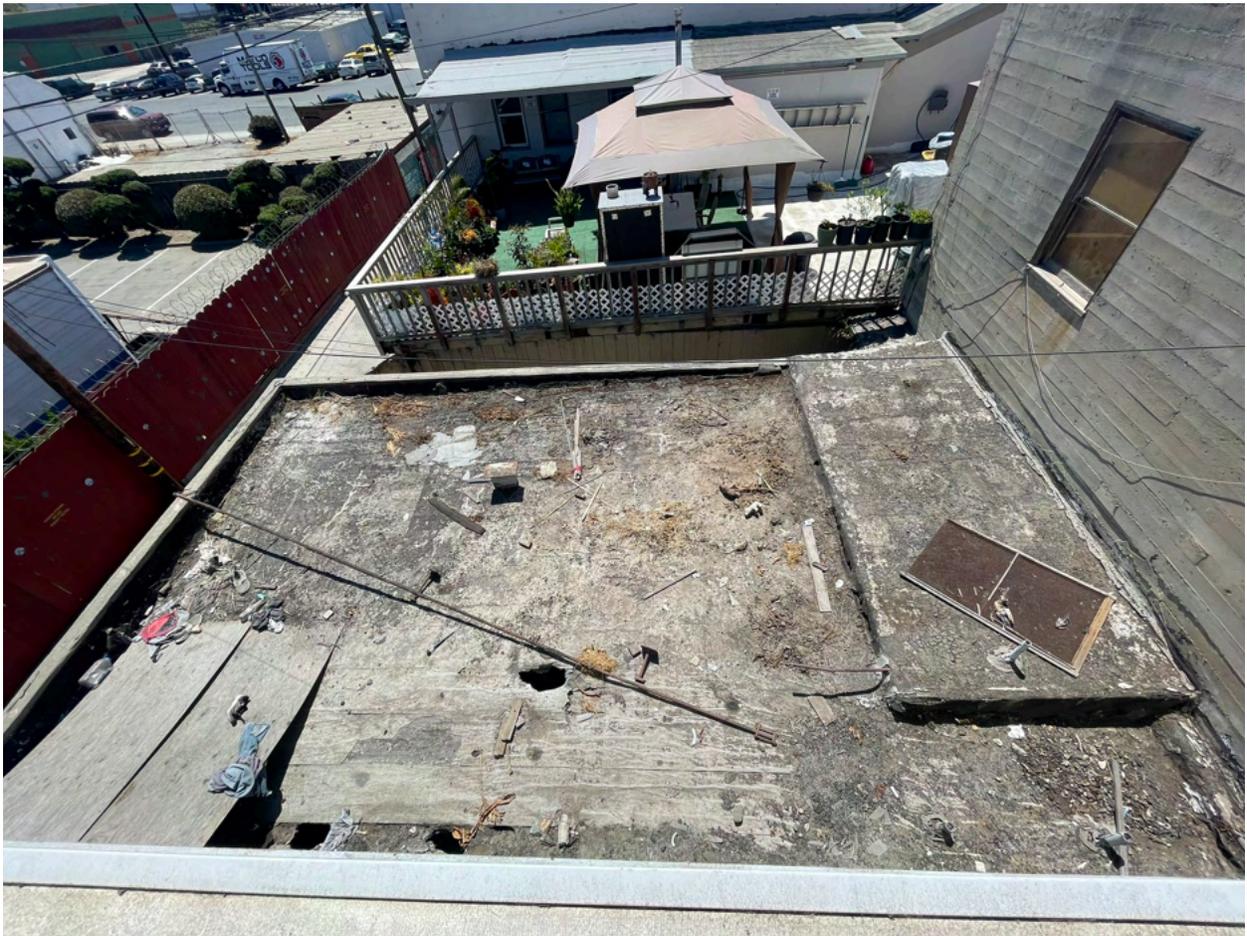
(Top) Example Lightwell, looking down between 37 and 39 Soledad. Groundwork Preservation LLC, 2025.
